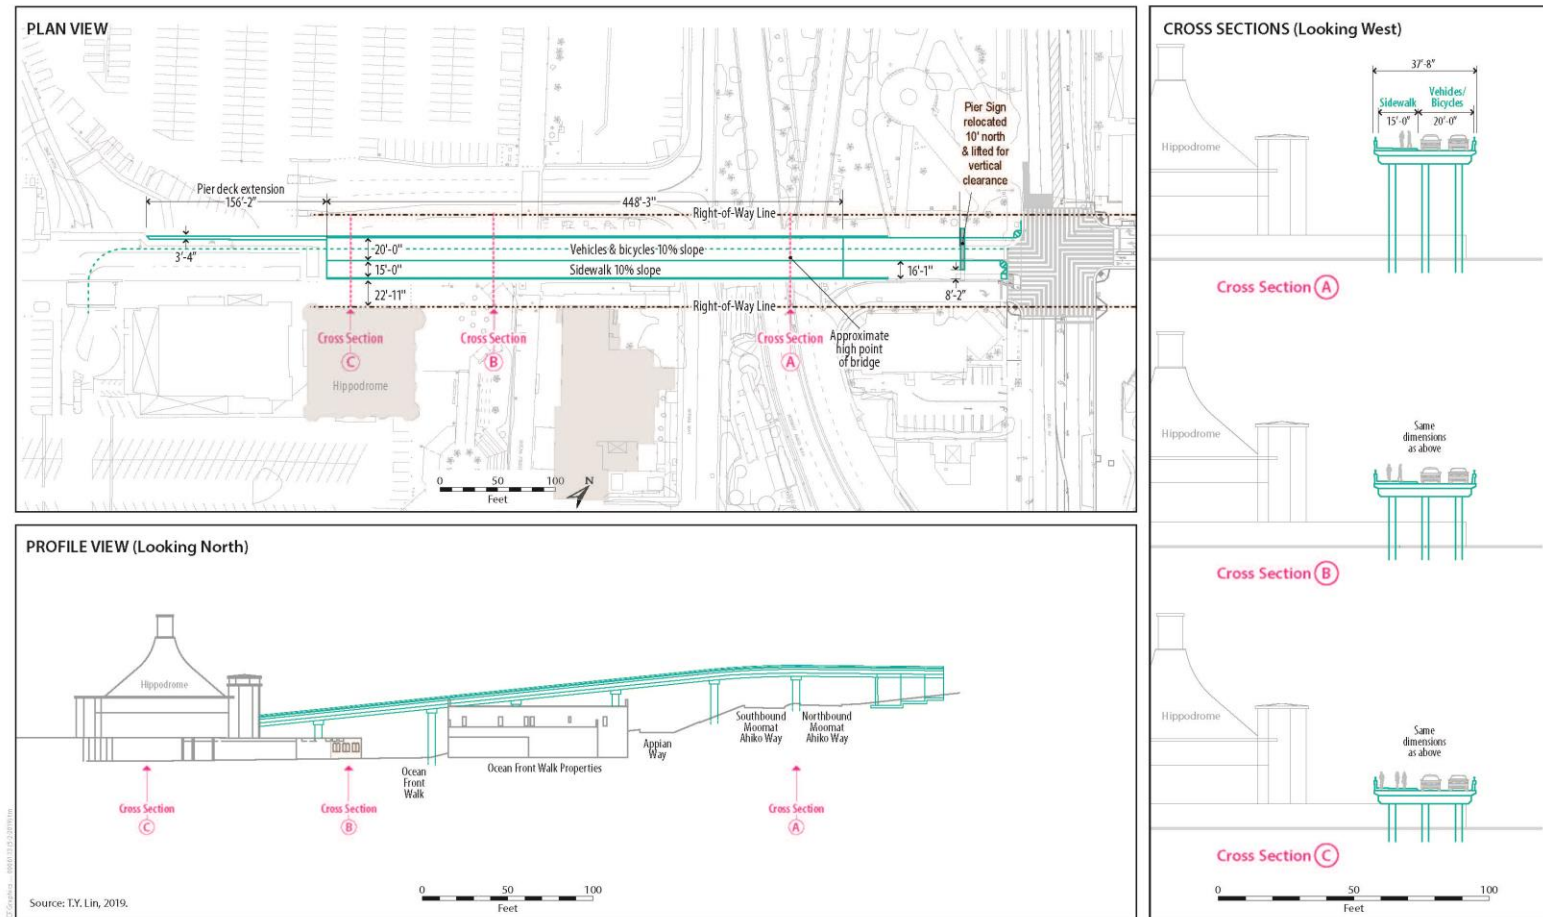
Alternative 2, In-Kind Pier Bridge Replacement with Southside Sidewalk
